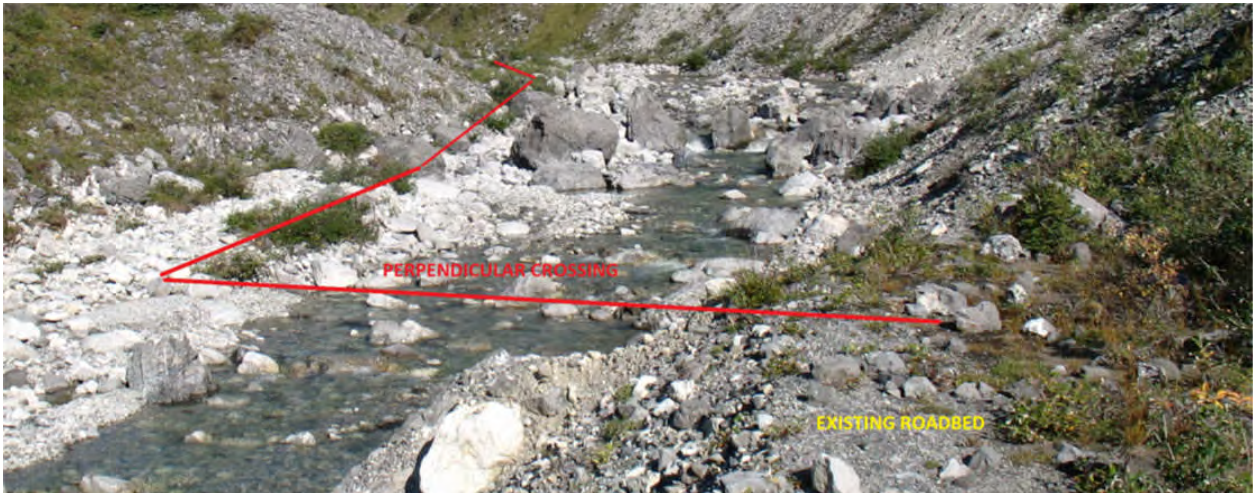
Sundog Temporary Crossing 3, Road KM 26.8. Viewing upstream.
